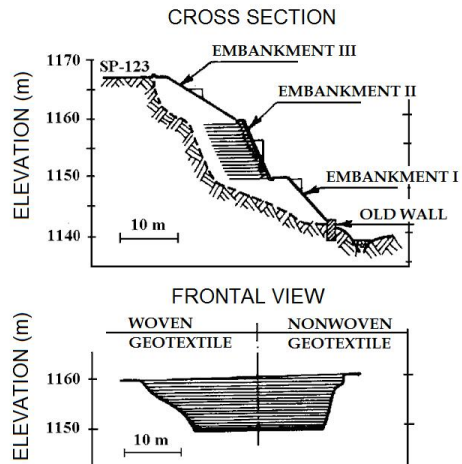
Embankment cross section and frontal view of SP123 Highway (Carvalho et al. 1986).
